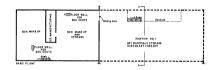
Second floor layout and section view of part of basic plant and additions.
